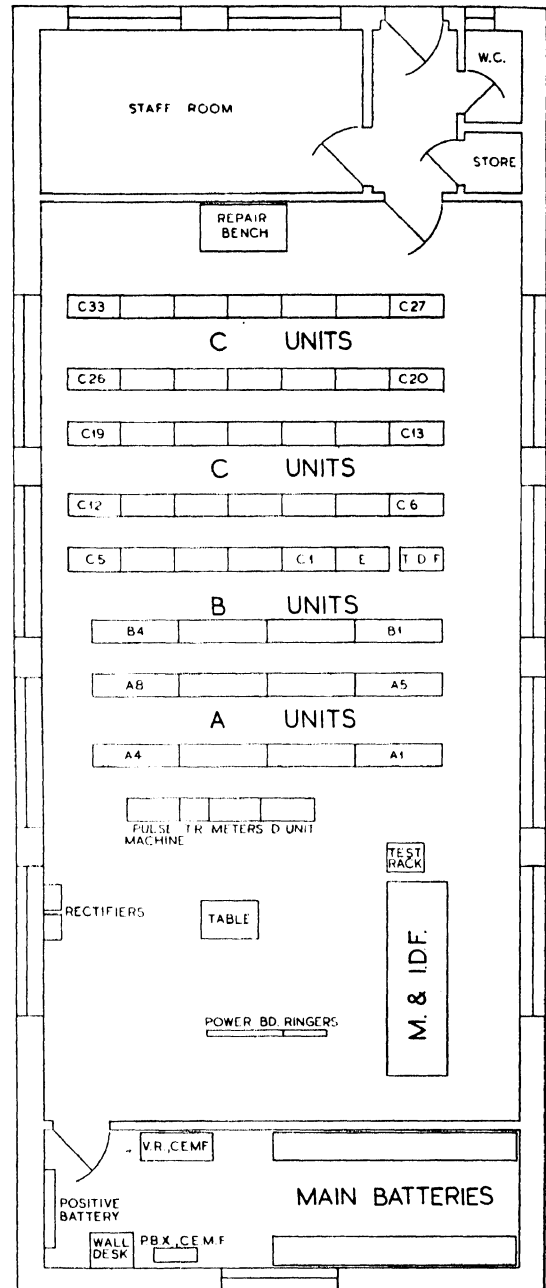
TYPICAL LAY-OUT OF APPARATUS OF A U.A.X. 14 IN A D-TYPE BUILDING
